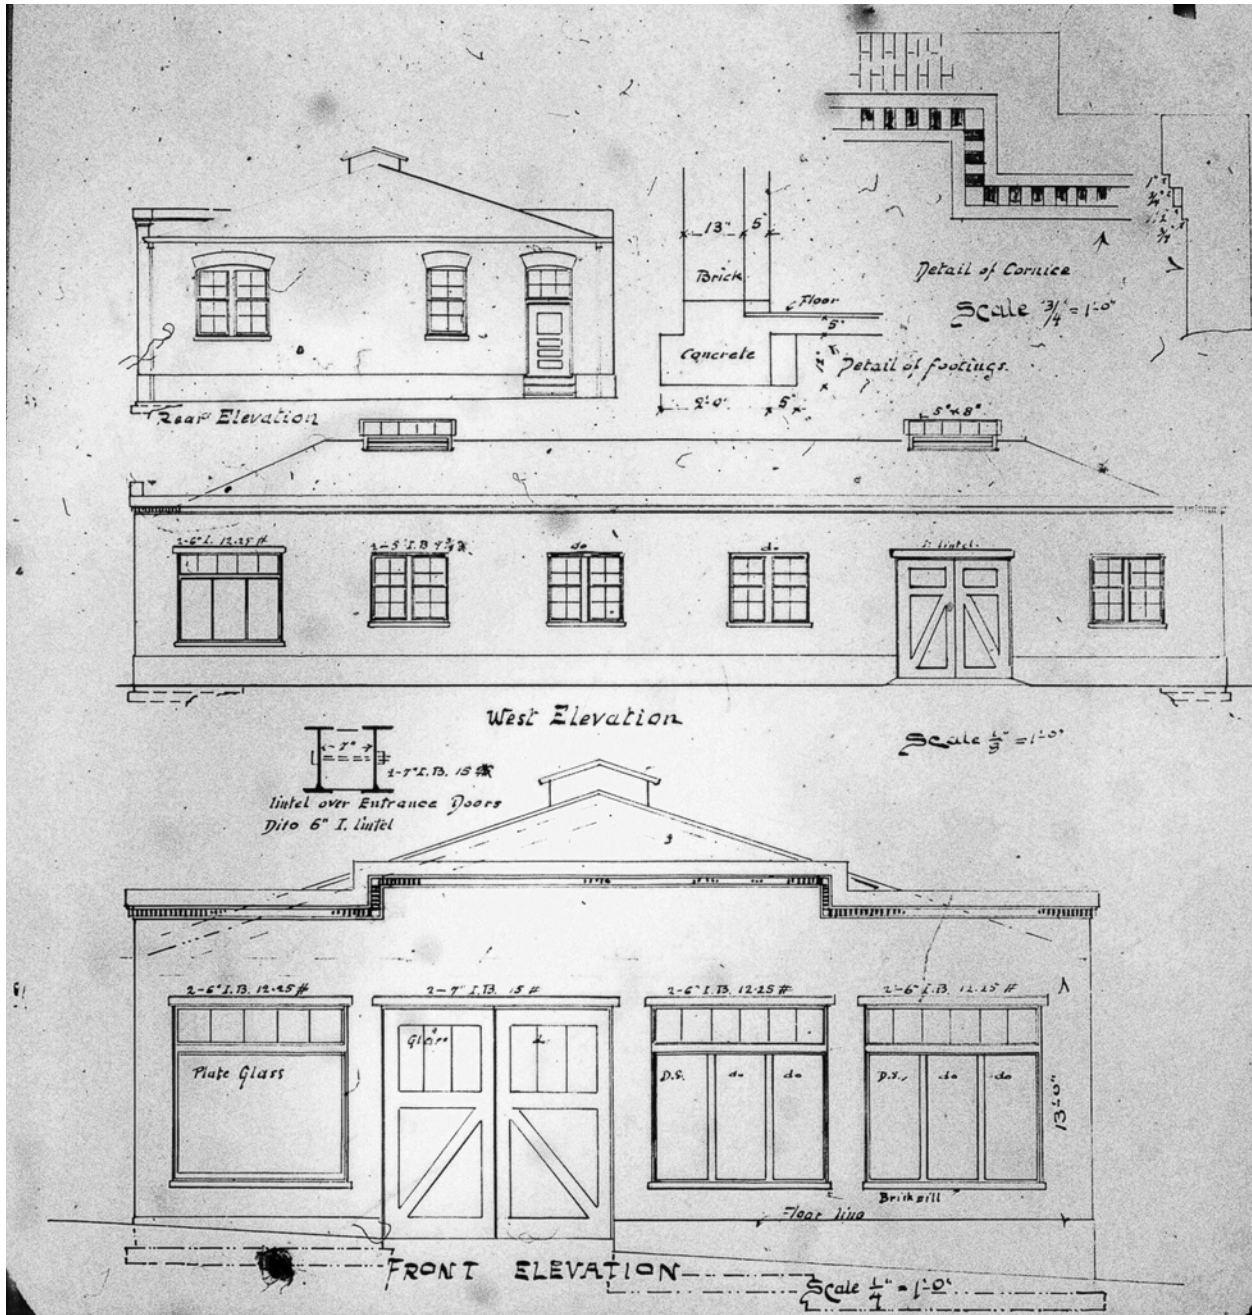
1001 S. King Street - Building Elevations and Details (no date)
